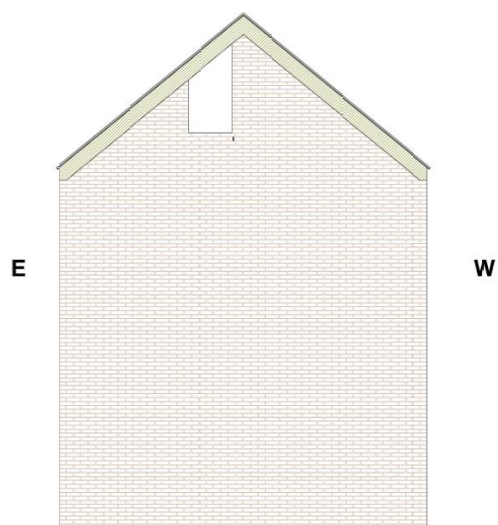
EQ-NPR 33% cracks – North clay façade.
